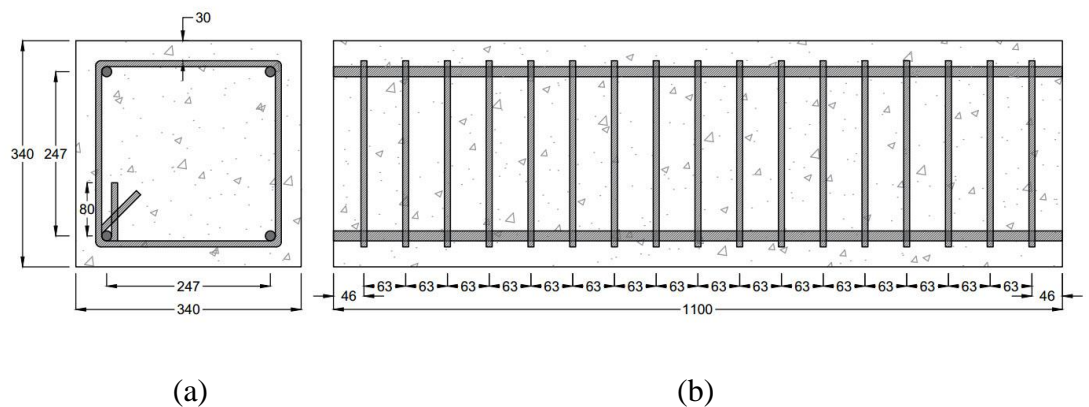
Reinforcement details of RC-63 column; (a) cross-section; and (b) longitudinal section (dimensions in mm).
